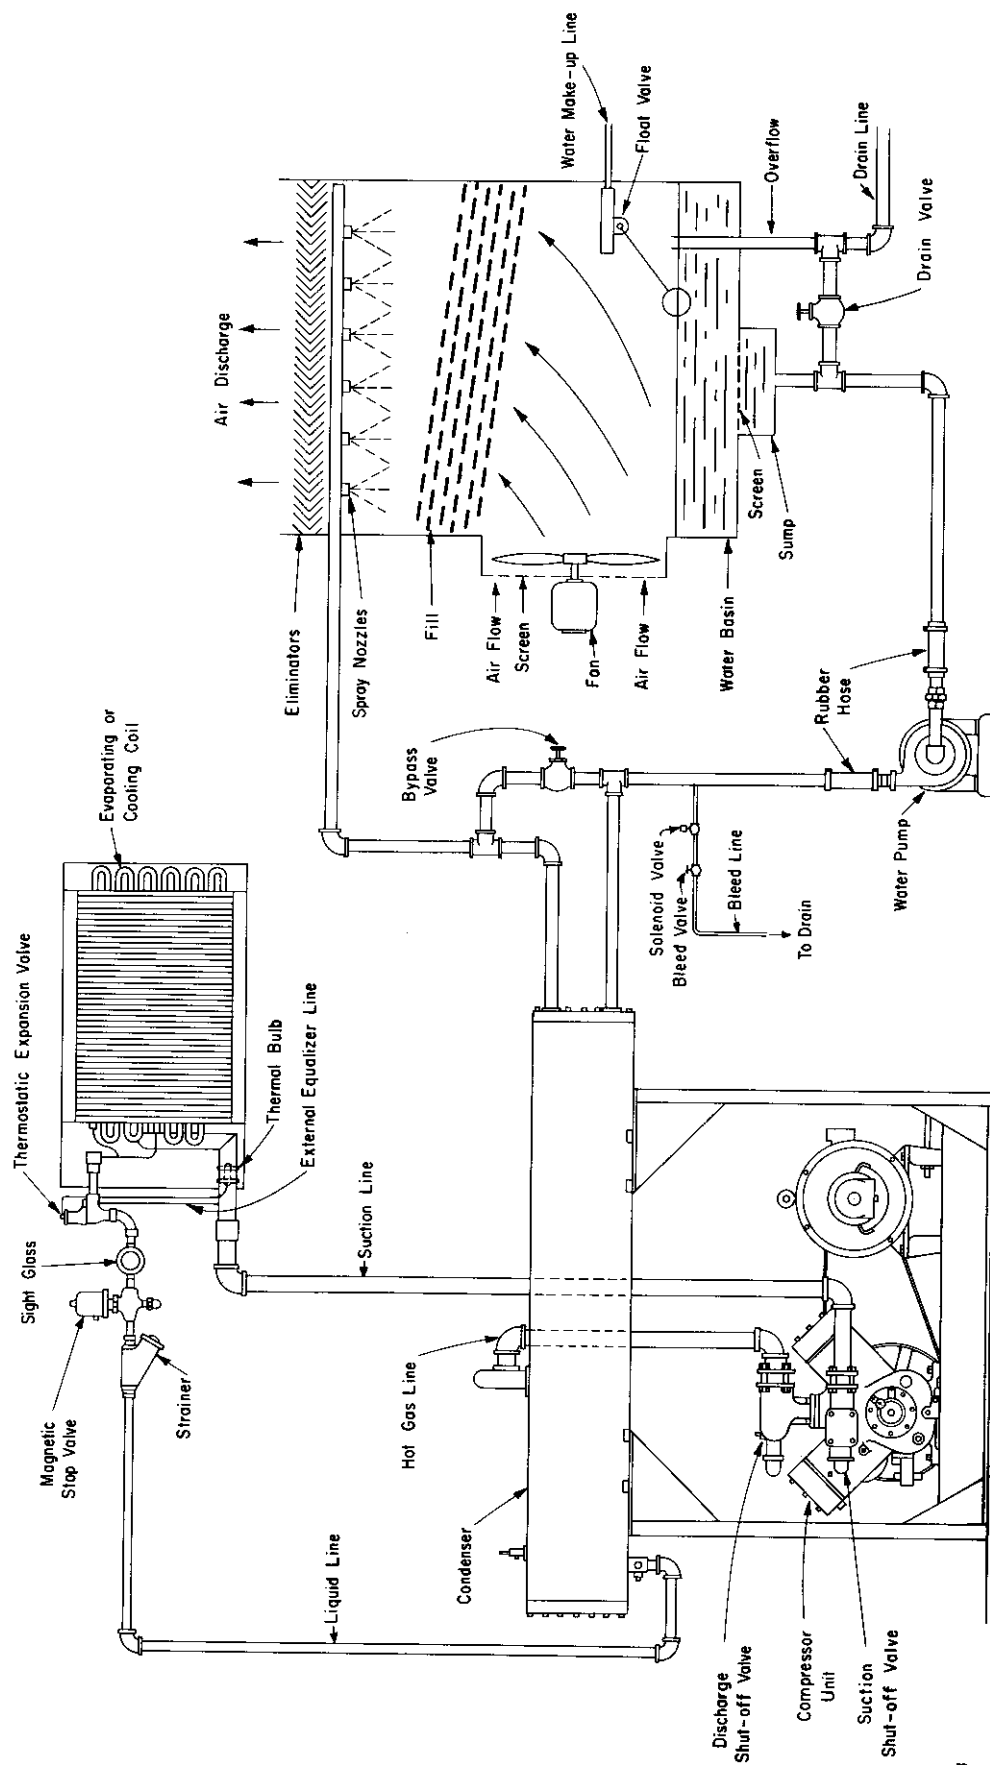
Forces Draft Cooling Tower Serving Refrigeration System
